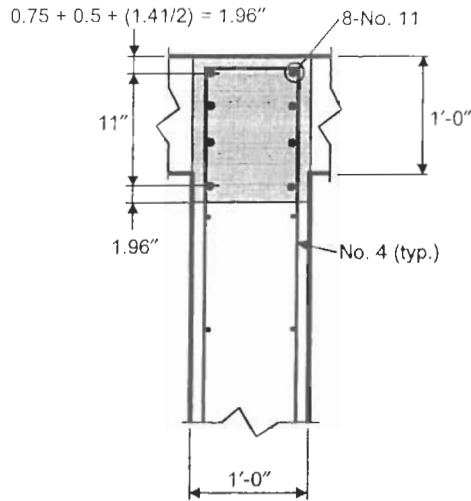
Longitudinal Reinforcement Ratio at Wall Boundary
